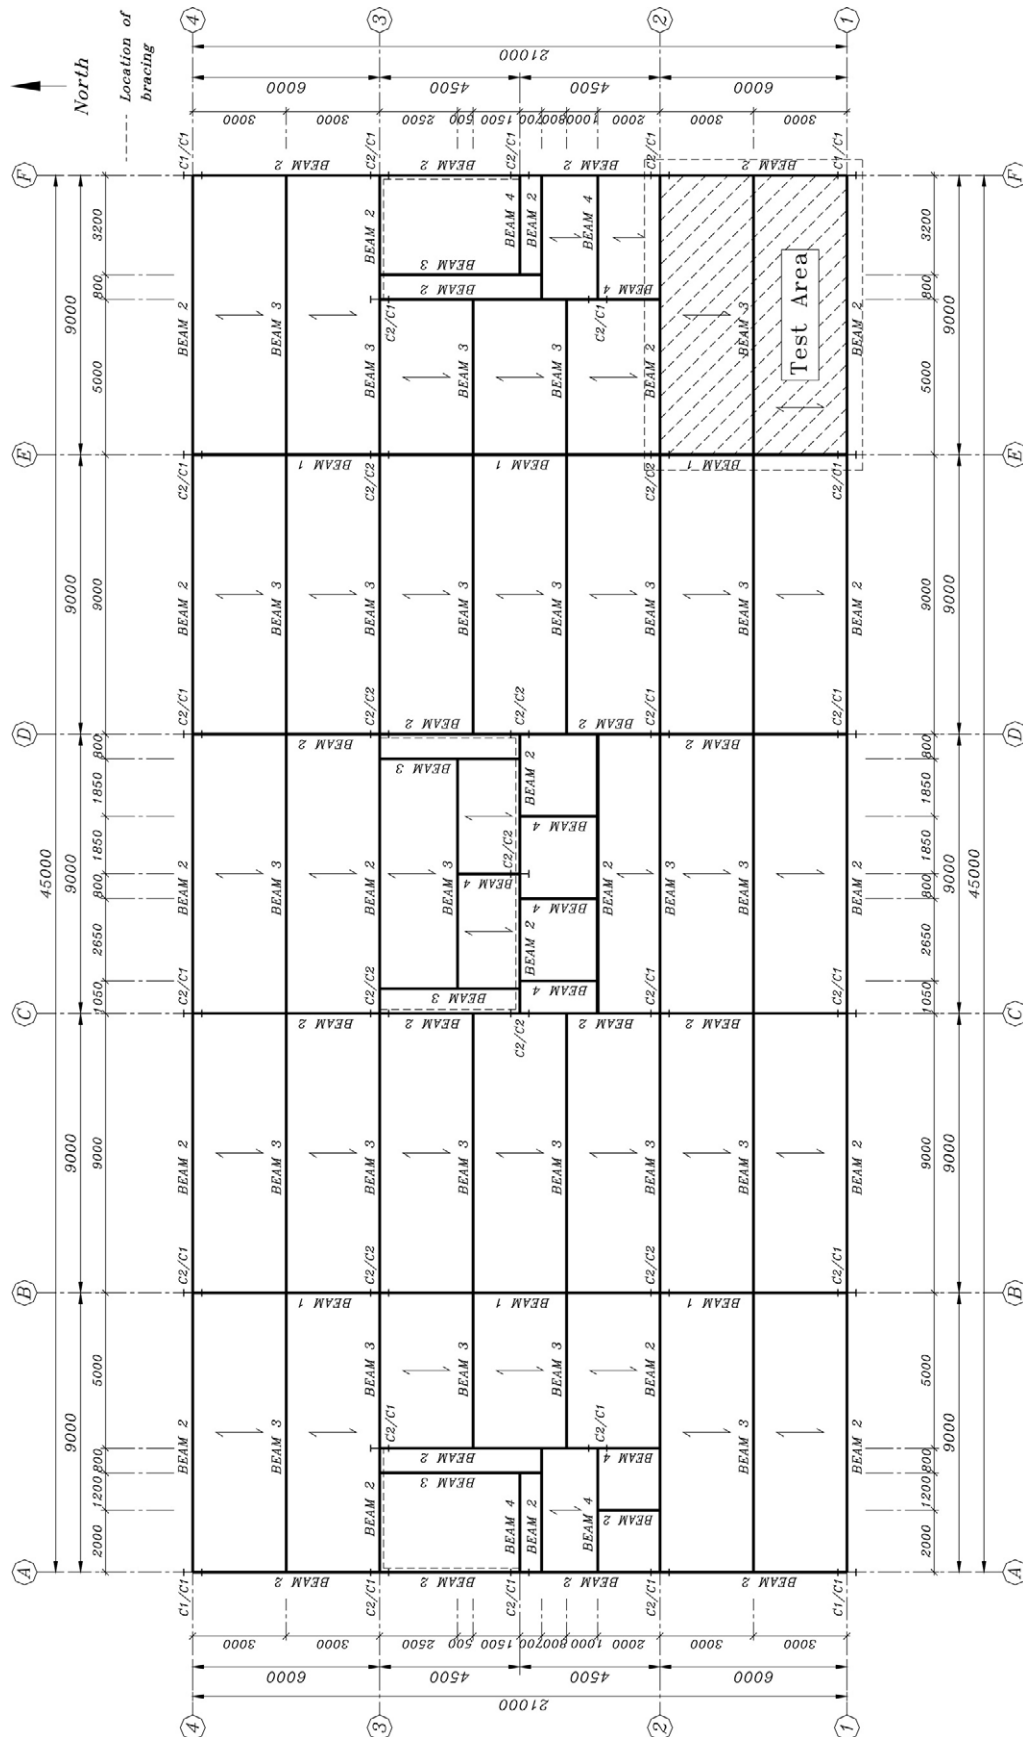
Typical plan for floors 3–7 of the Cardington steel building [8].
